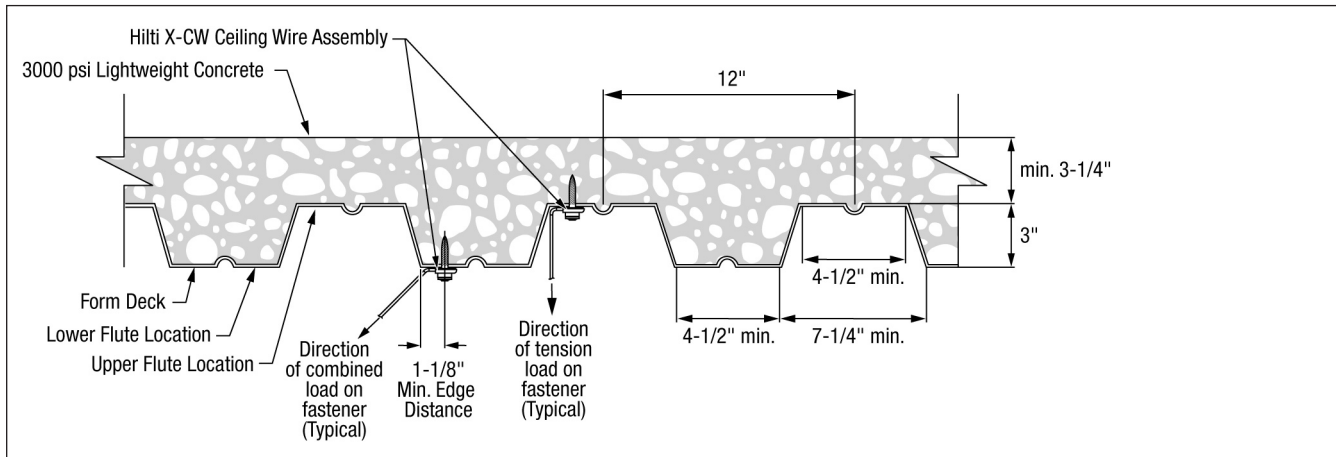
Hilti X-CW Ceiling Hanger Assembly Location in 3-in.-Deep Composite Floor Deck, Normal Deck Profile Orientation
